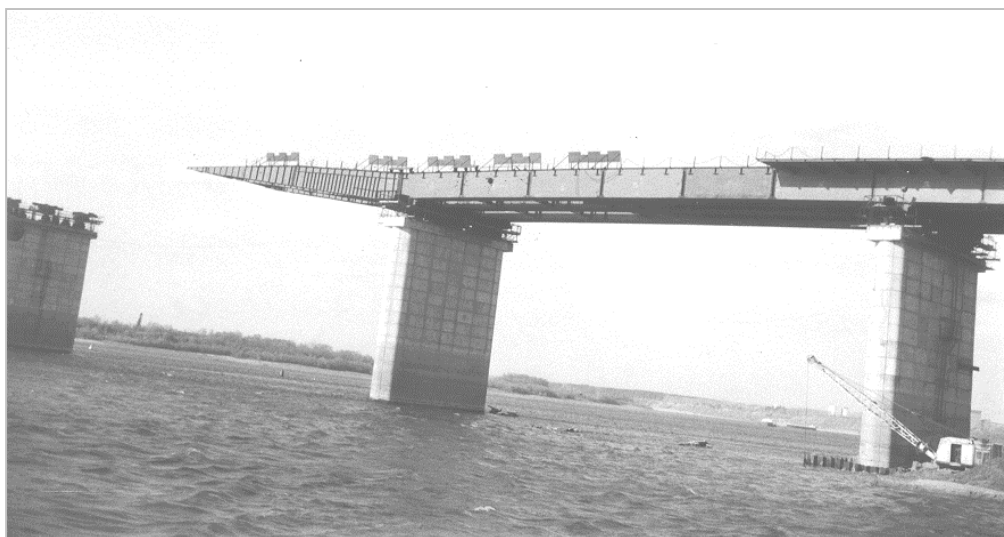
General view of the full-scale Tomsk bridge with dampers
